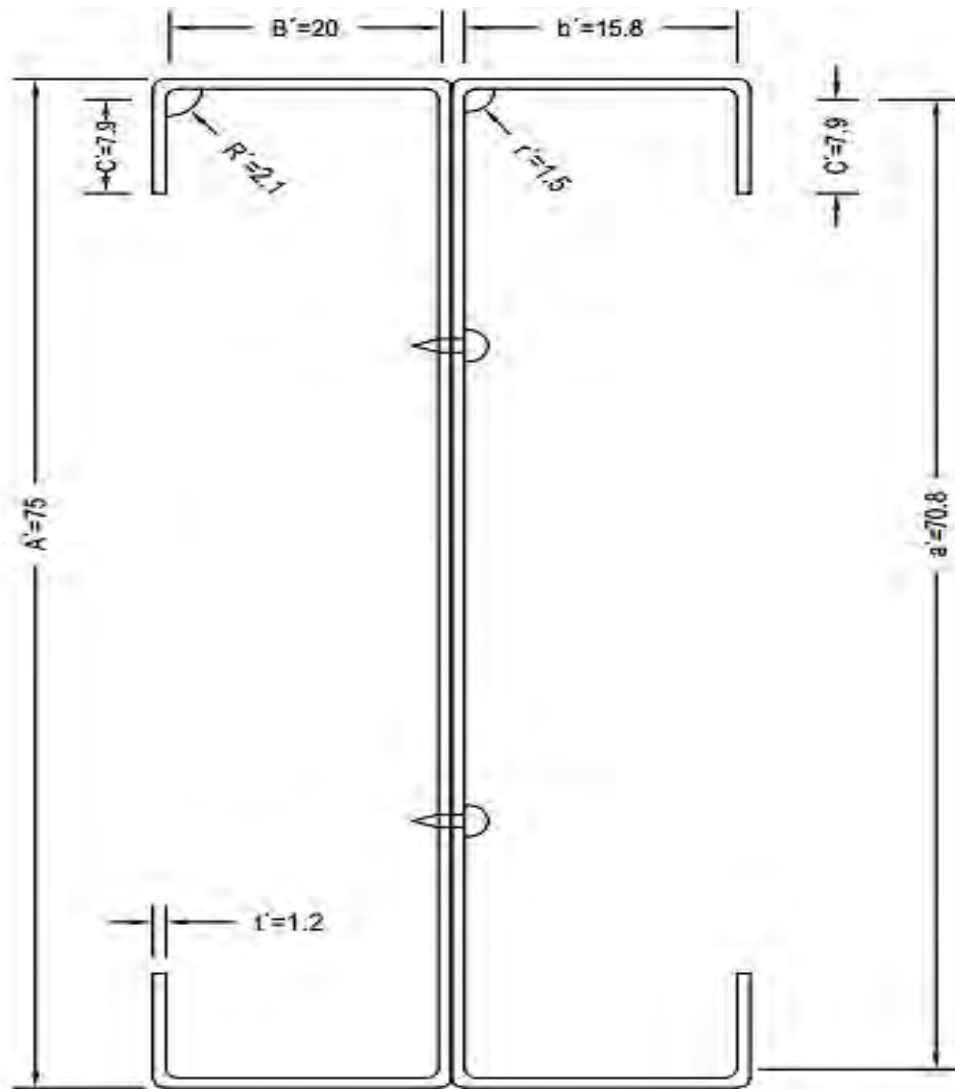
Details of back-to-back built-up cold-formed steel channel-sections studied by Ting [3]
